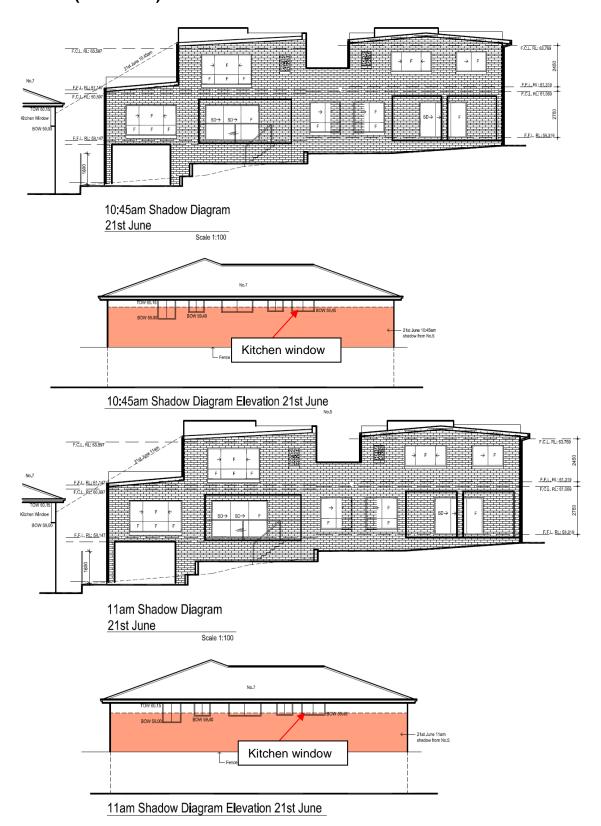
Shadows cast over No. 7 Farnell Street on 21 June.
